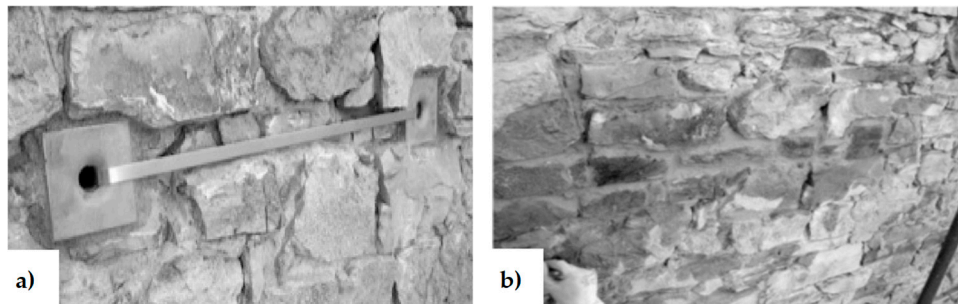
a) Arrangement in slit of a steel ribbon and the protective steel plates; b) Restoring of the cover stone material.
